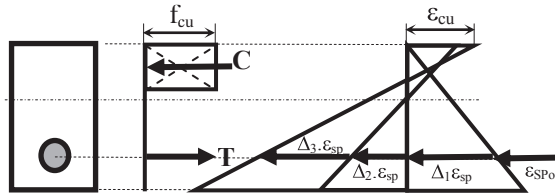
Block diagram illustrating strains and forces in prestressed concrete section at ultimate condition (Raka 1993)
